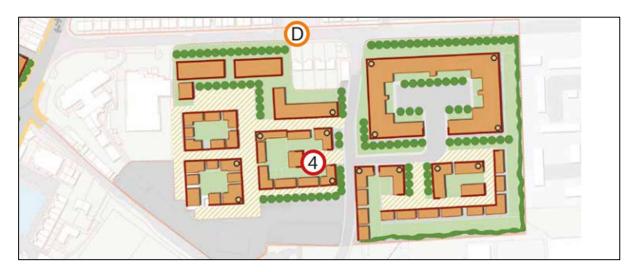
Example layout of the proposed site located within the Southern Gateway Masterplan SPD
